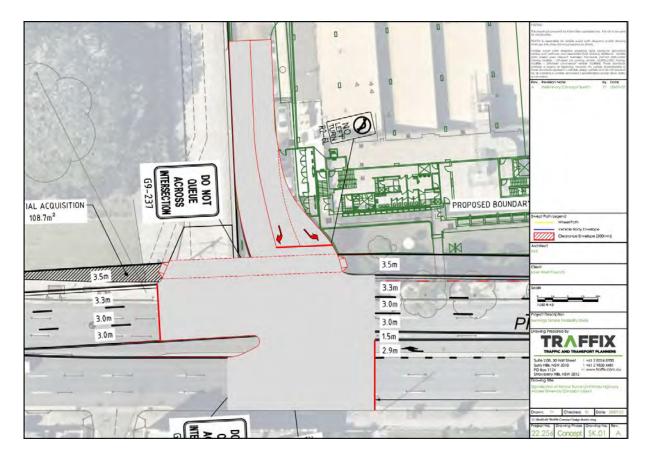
Concept Plan for Bunnings Tempe Signalised Princes Highway Access Driveway
